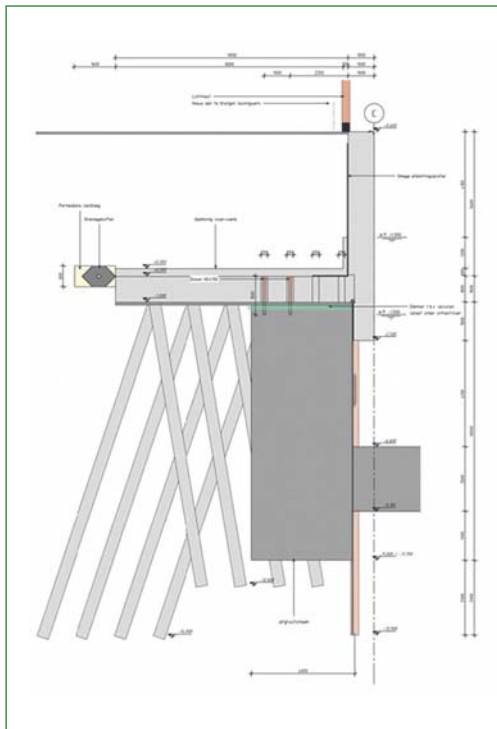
A mass of jet grouting (dark grey) is made as a final construction, forming a retaining wall and foundation behind the patched sheet pile wall (orange), underwater concrete at the lock chamber side is also dark grey.
